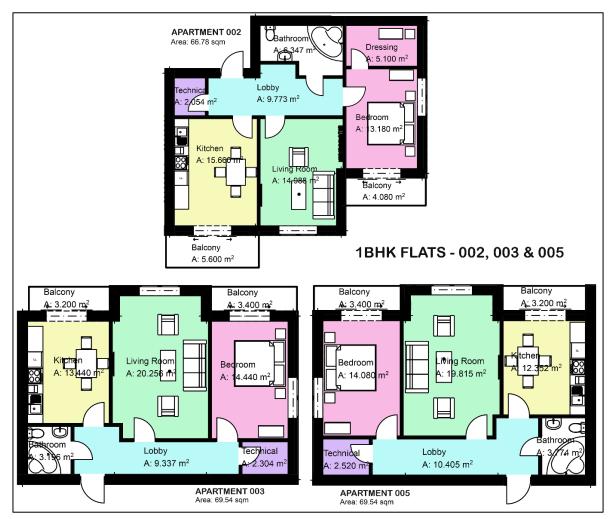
1BHK Flat specifications - Ground floor. Source: (By Author)
